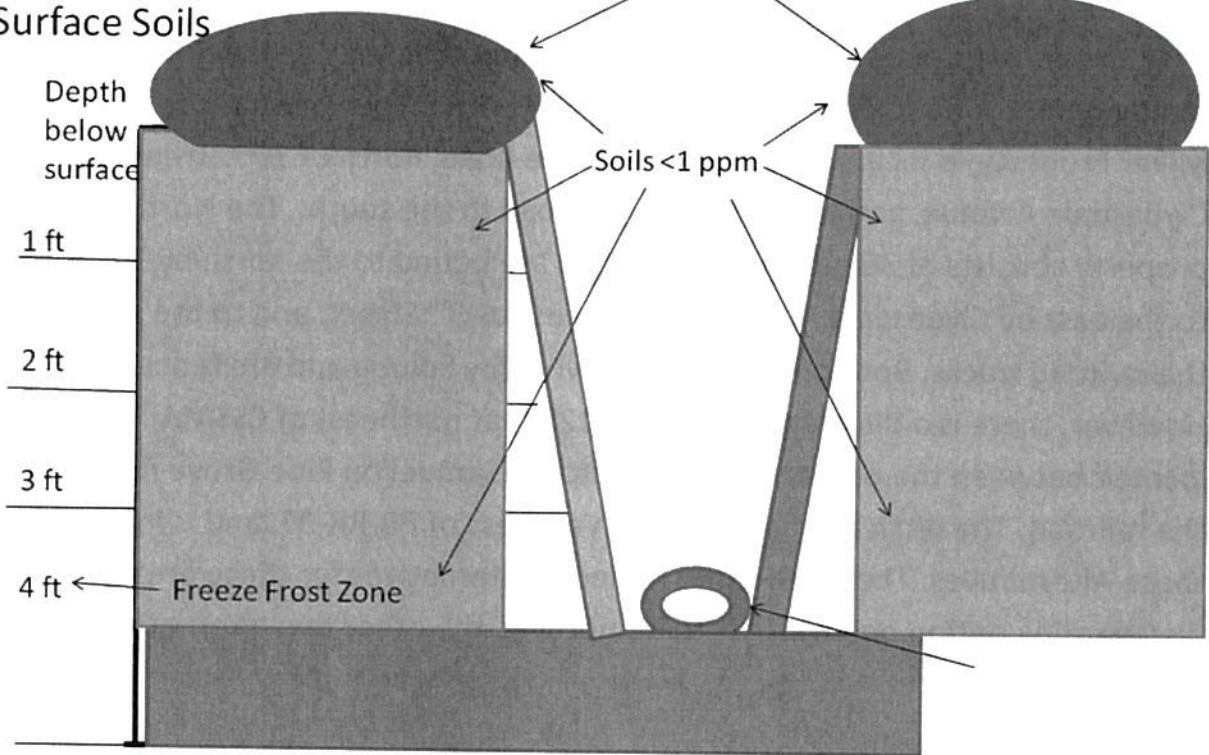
Repairing Busted Water Pipe with Residential Remedial Alternative #3.
